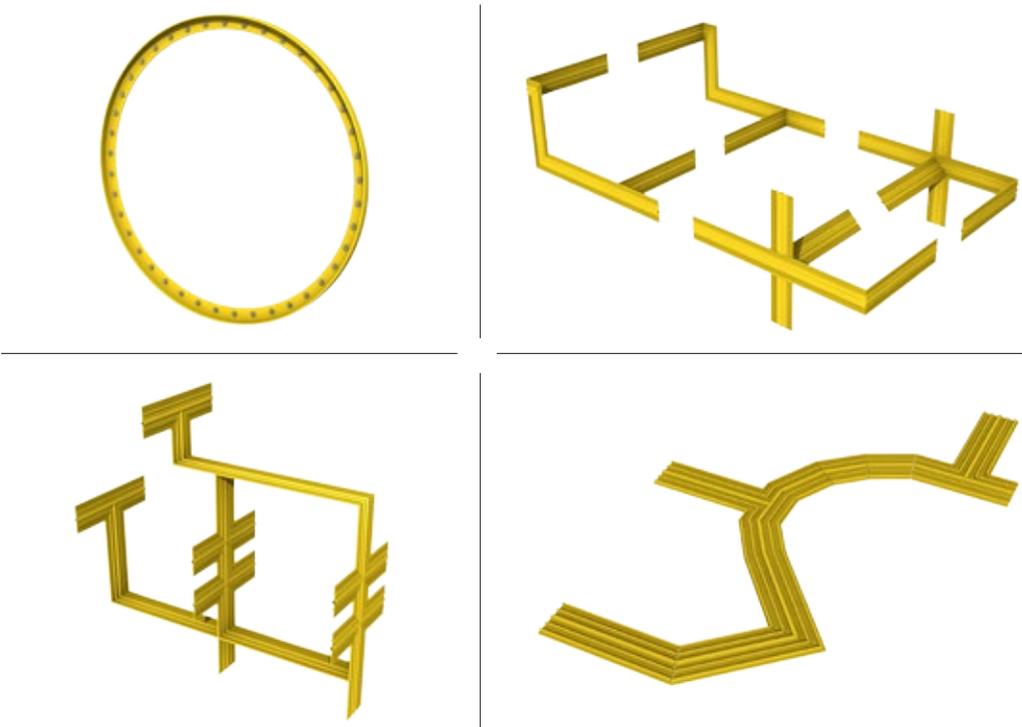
Examples of prefabricated waterbar profiles and system sections
